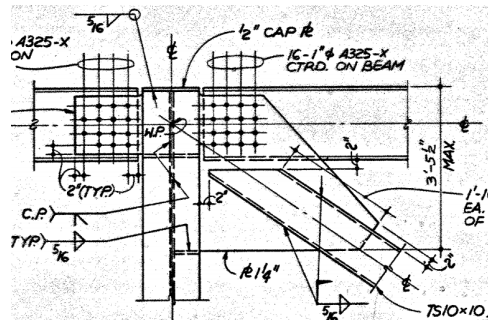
Bottom Connection Detail (83CA3A--P-1415-3)
